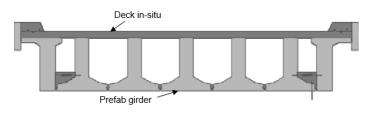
Cross-section of inverted T-girder bridge [33], adapted.
